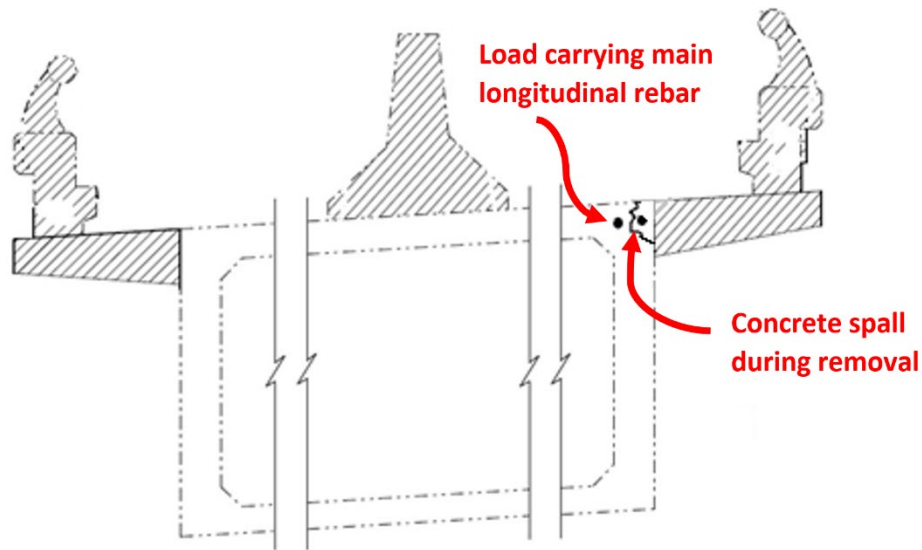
Bridge Cross Section and the Main Longitudinal Rebar Needing to Remain in Place
